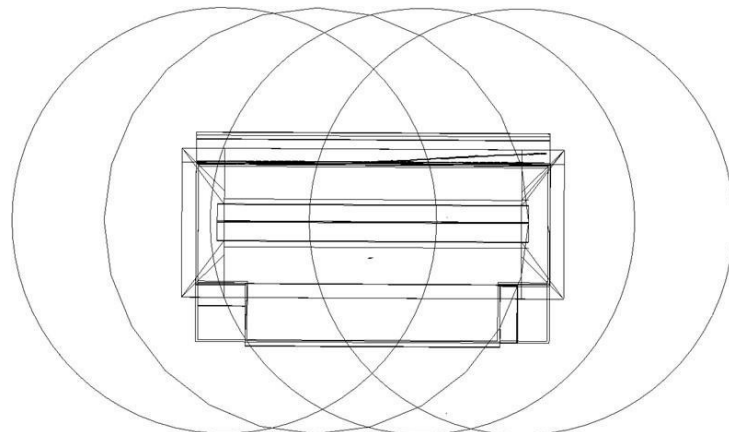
Protection angle of Building B12 Electrical Engineering FT UM (top view)
